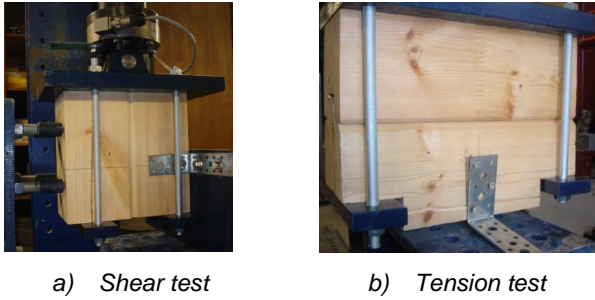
Specimens layout used for the tests of the connection between the first log and the foundation
